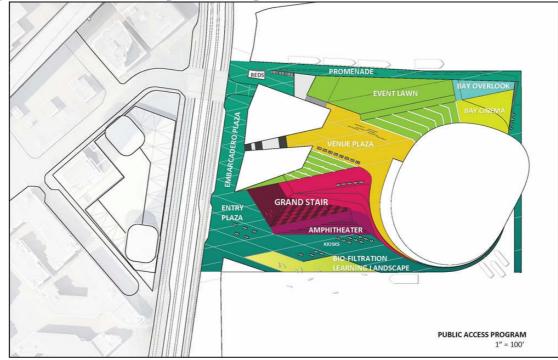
Illustration of Proposed Development of Pier 30-32, with Seawall Lot 330 Outline
